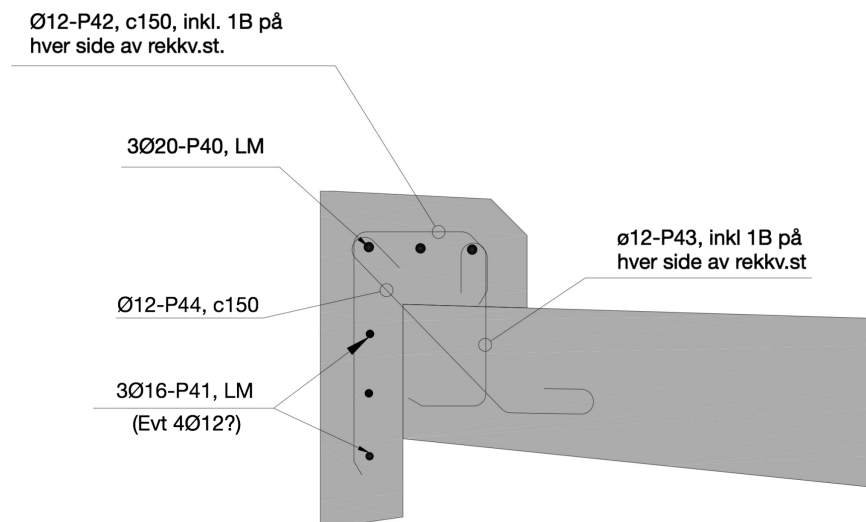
The reinforcement drawing for the edge beams at Sandsgård Bridge.
